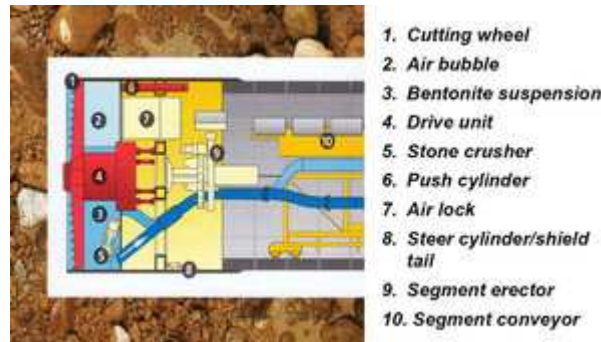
Slurry shield illustration (International Tunnelling and Underground Space Association, n.d.-b)
